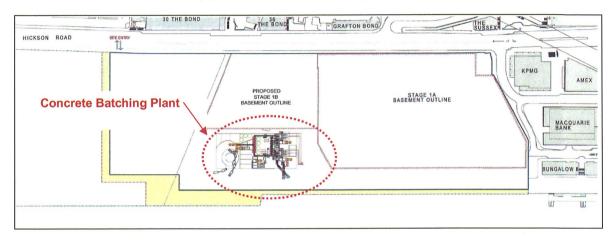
Location of approved concrete batching plant (MP06\_0162 MOD4)
